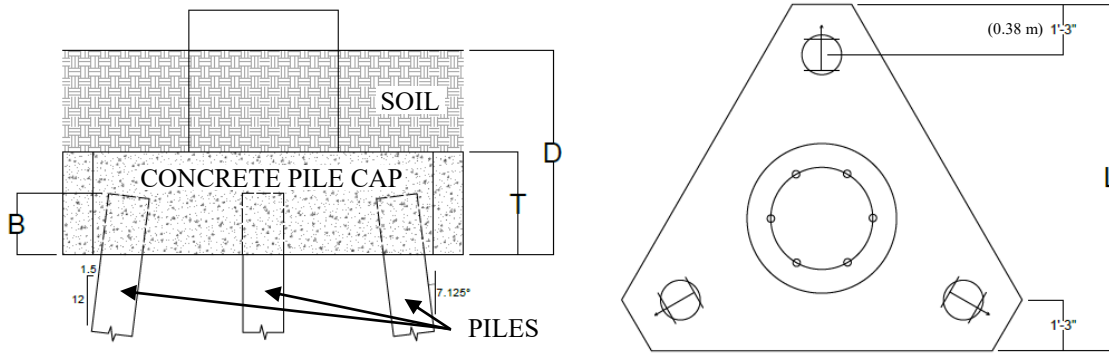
Typical HMLT foundation geometry (cross section and plan view).
